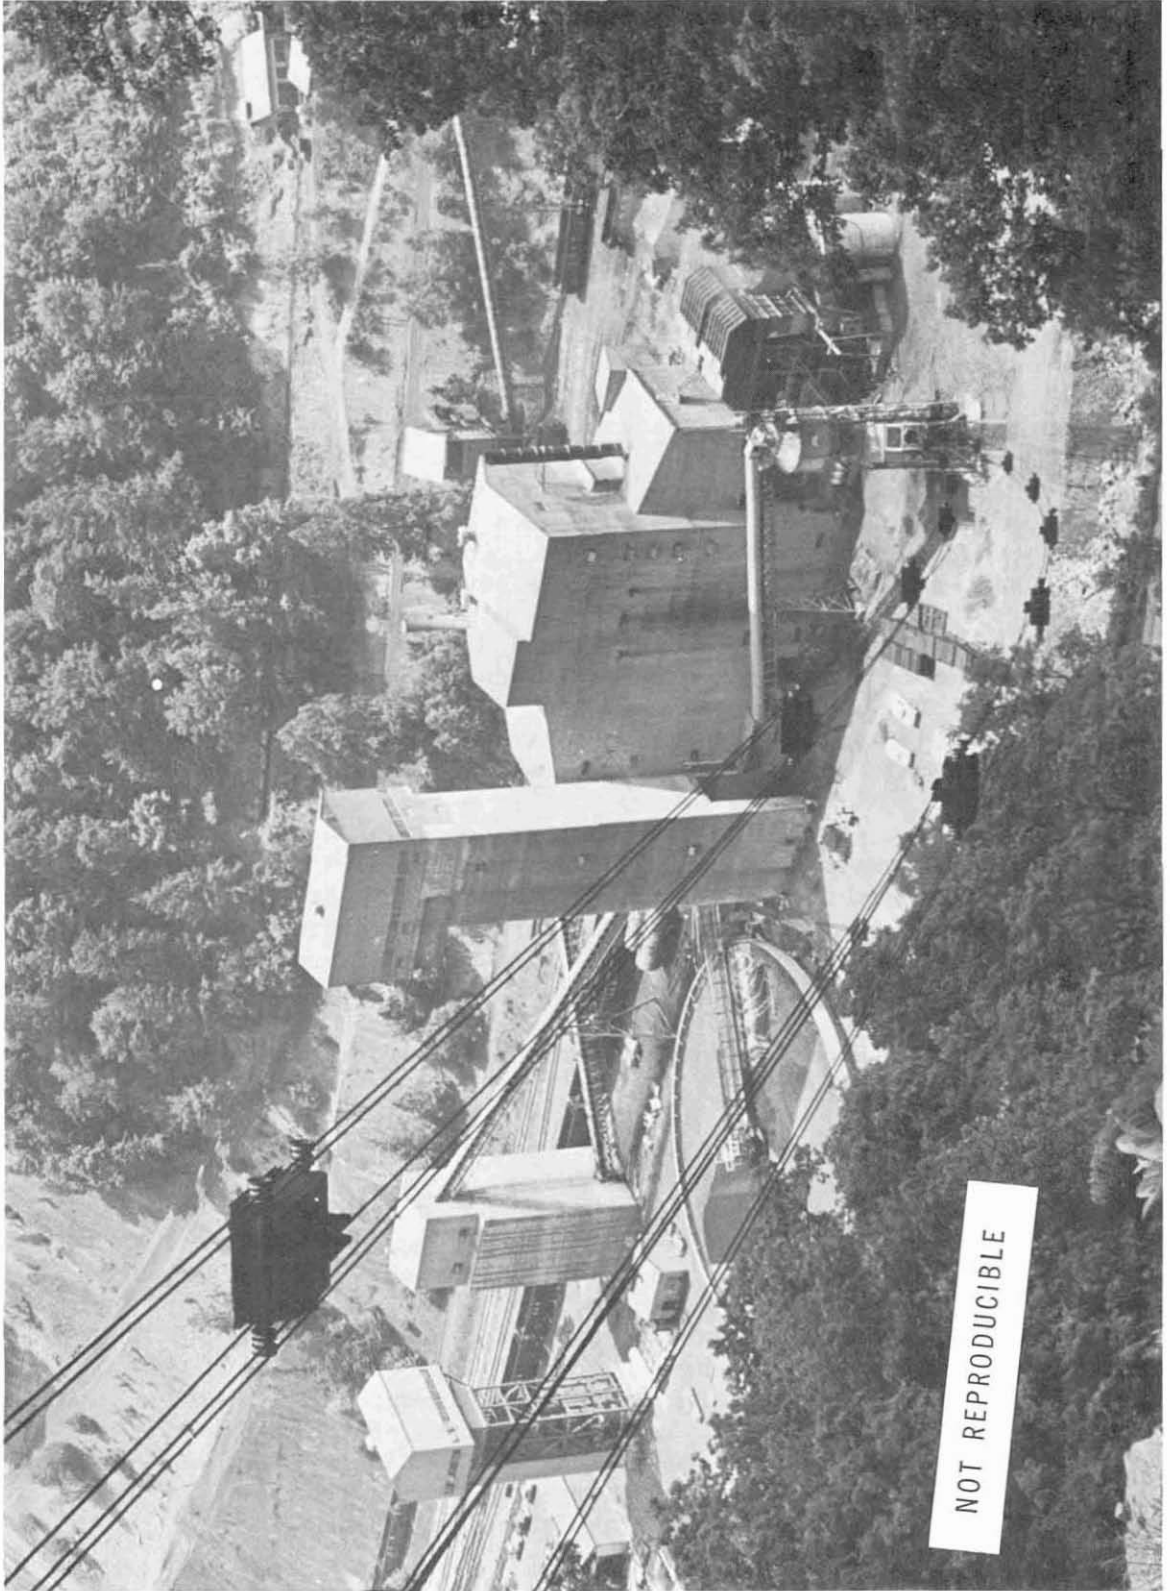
Koepe Hoist Towers. Left; Man hoist; center; coal hoist.
